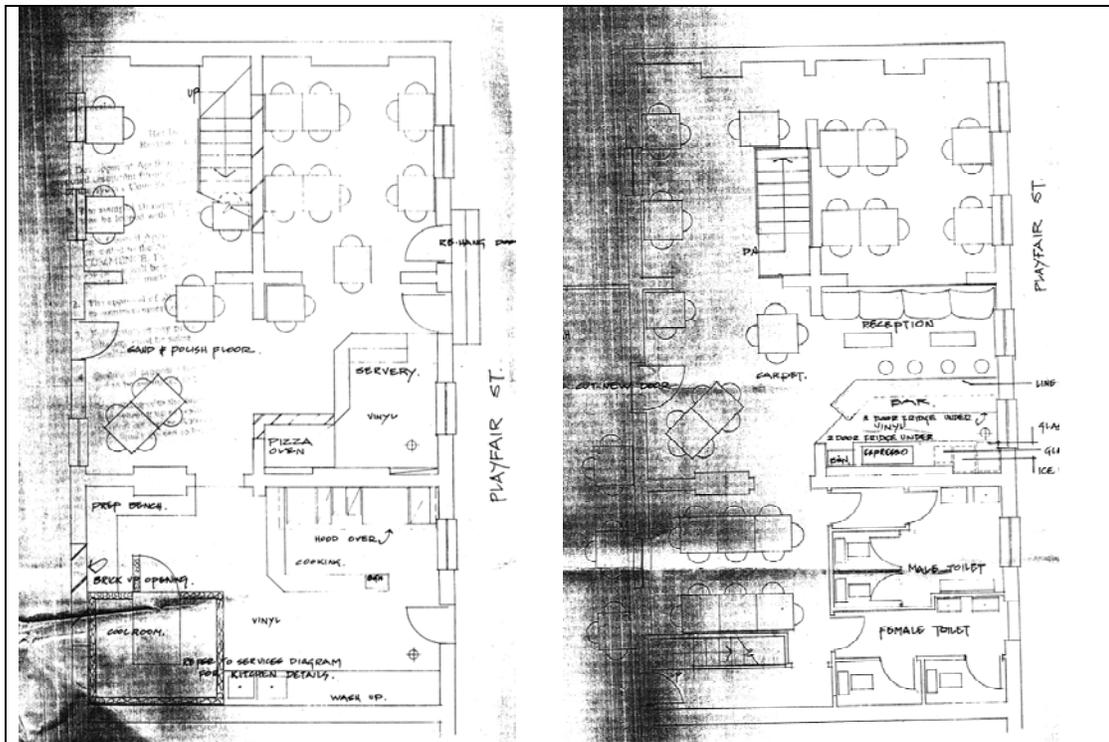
The plans for the Caminetto Restaurant in Nos. 13-17. (Source: Foreshore Authority Archives RE 1199.01.01)
